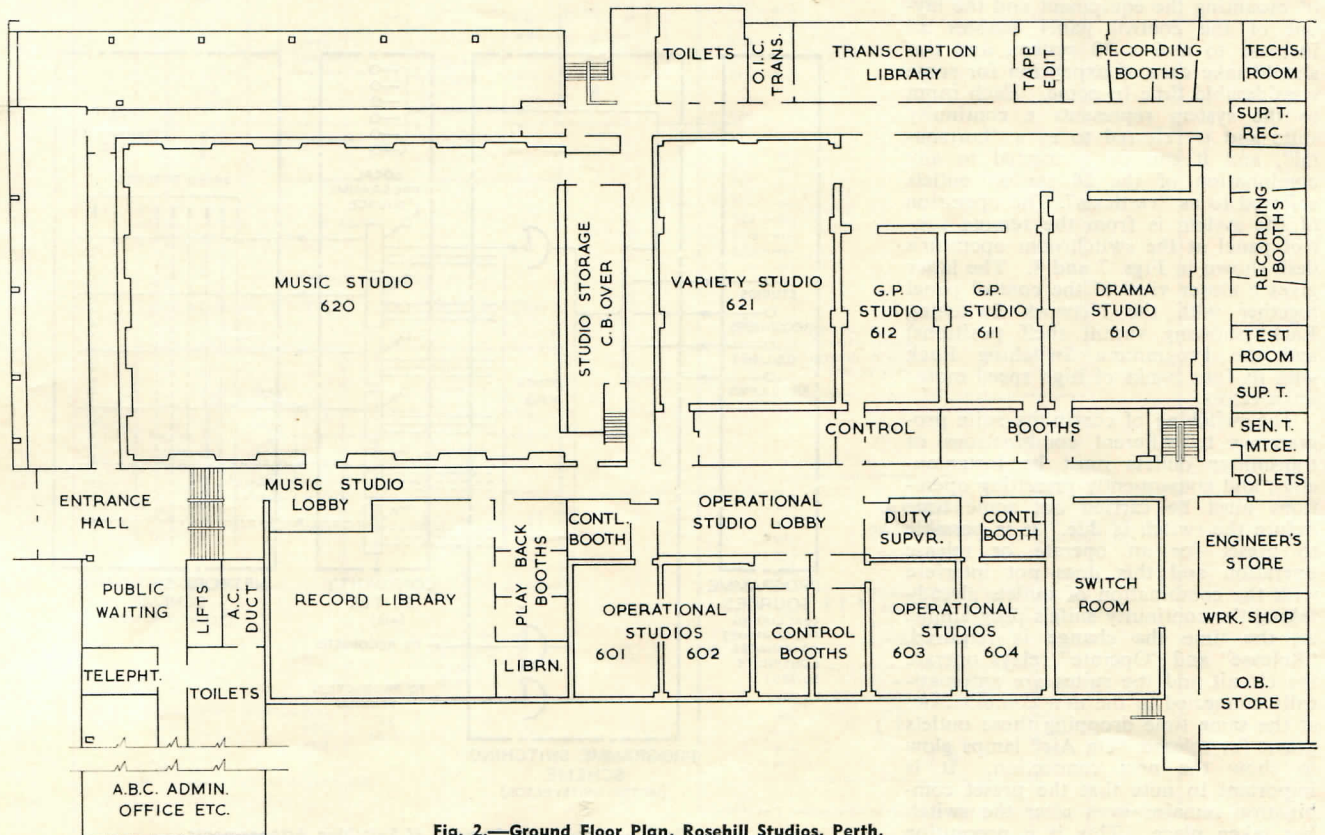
Ground Floor Plan, Rosehill Studios, Perth.
